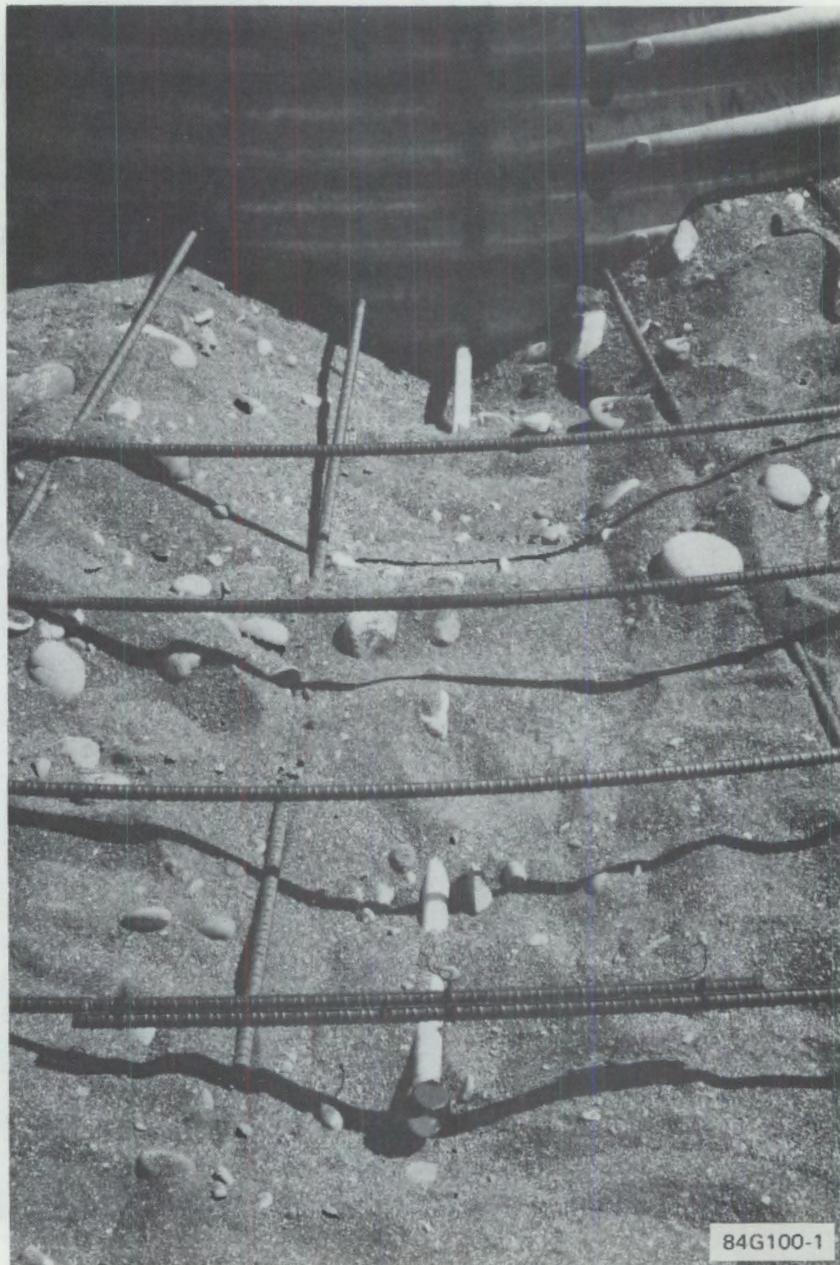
Drainline from a Lysimeter to the Instrument Caisson
